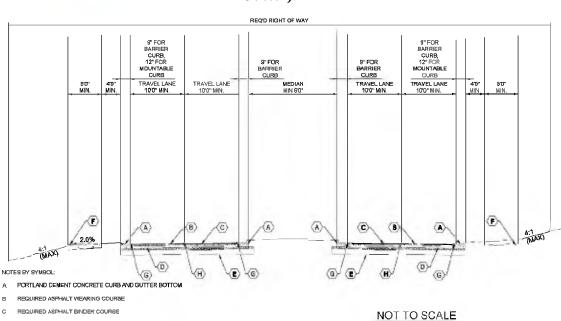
Typical Section Requirements for 4 Lane Roadway (with Curb and Gutter).
